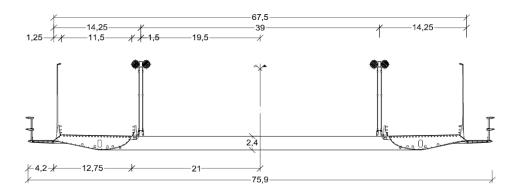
Cross-section of the deck with main suspension cables spaced 39 m apart.
